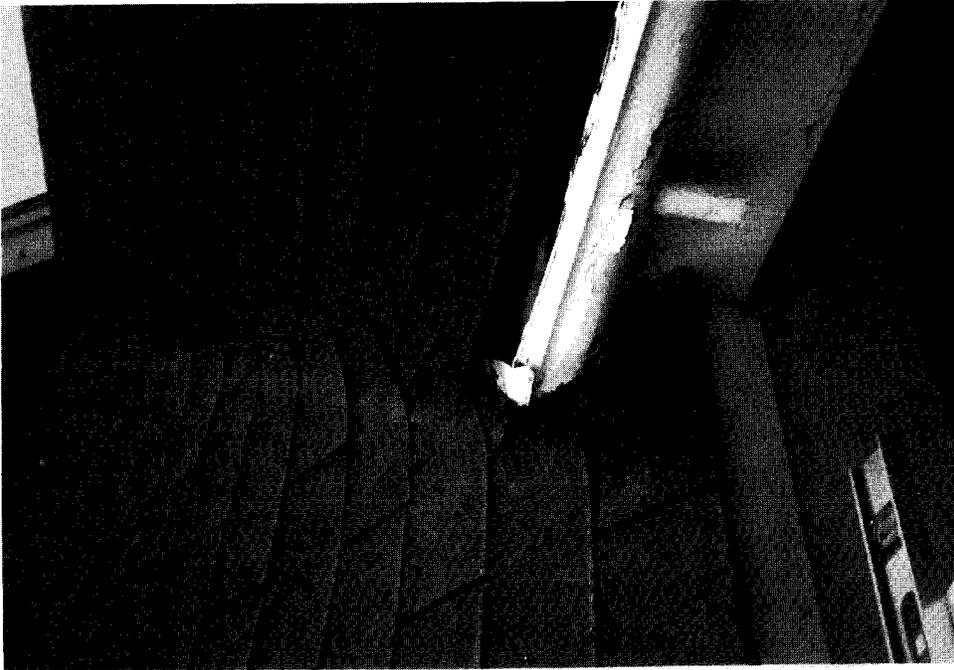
Connector at Keeper's Dwelling, east elevation, south end of built-in roof gutter.
